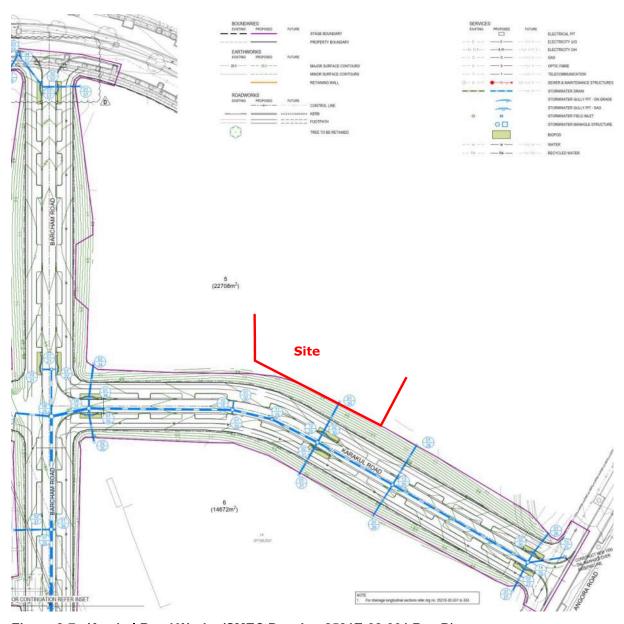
Karakul Road Works (SMEC Drawing 2521E-02-301 Rev D)
